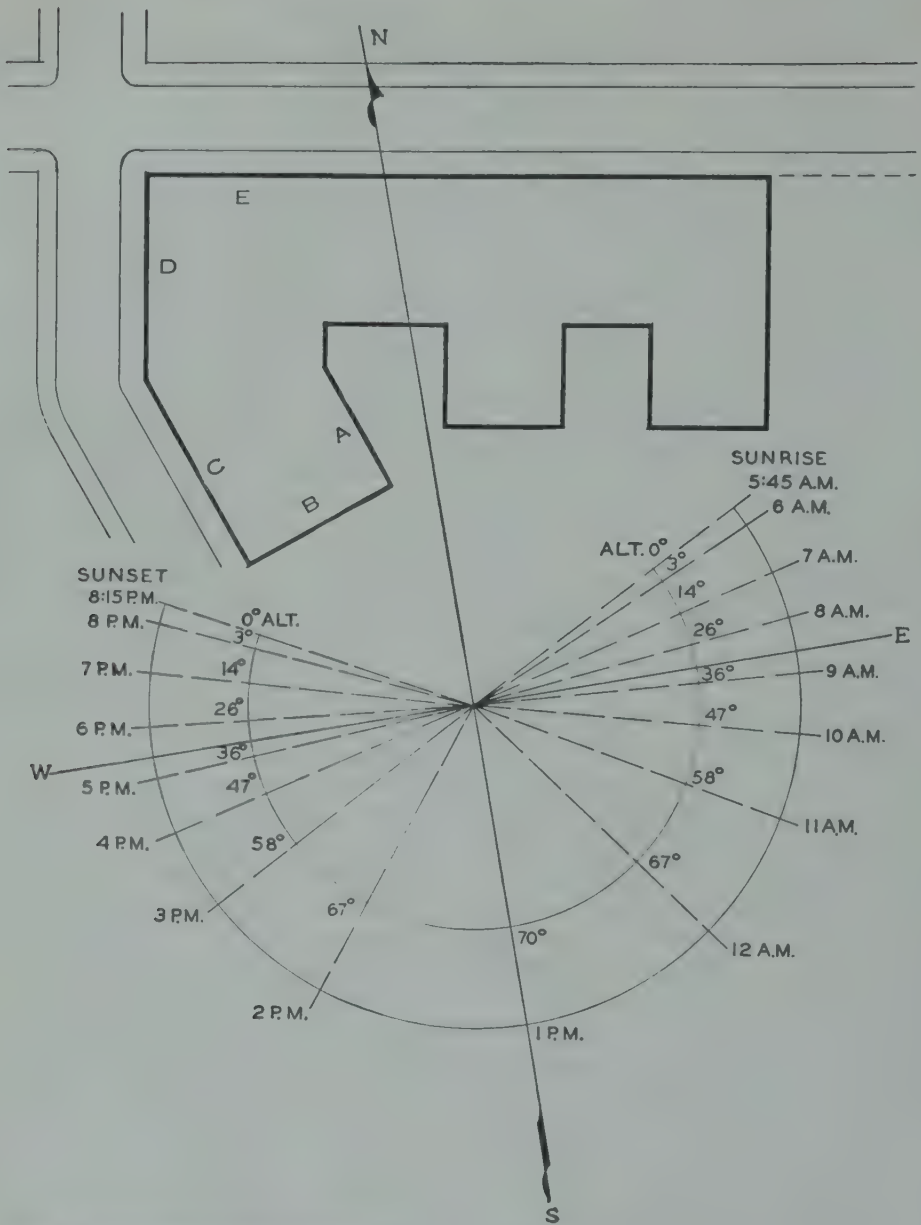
Block Plan of Office Building; Sun Angles on July 25, 40° North Latitude (Daylight Saving Time).
